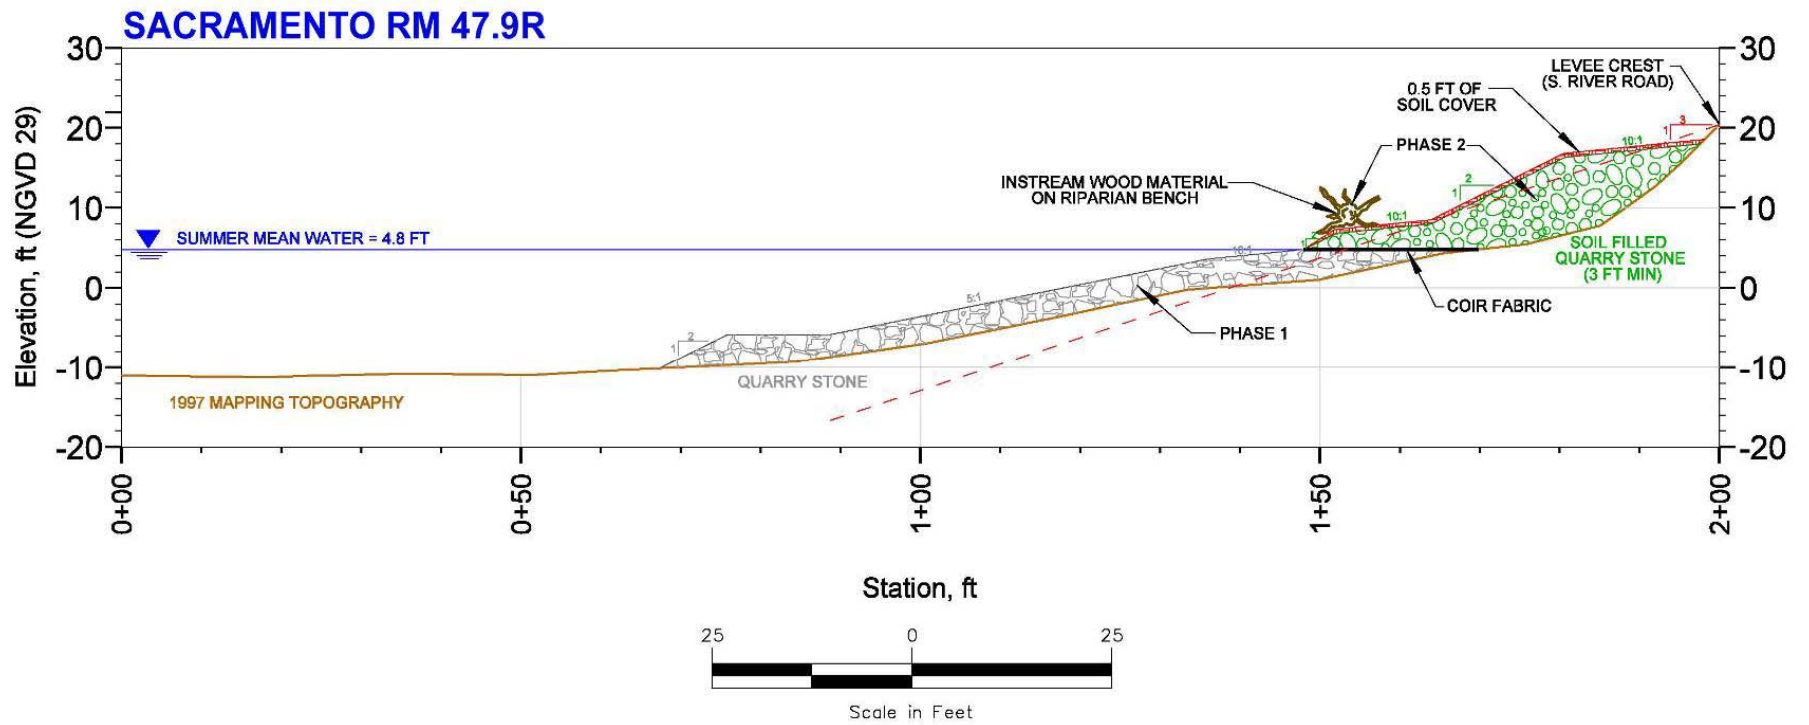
Conceptual cross section of Site RM 47.9R. Ayres Associates, Sacramento, CA, 8 November 2006.
